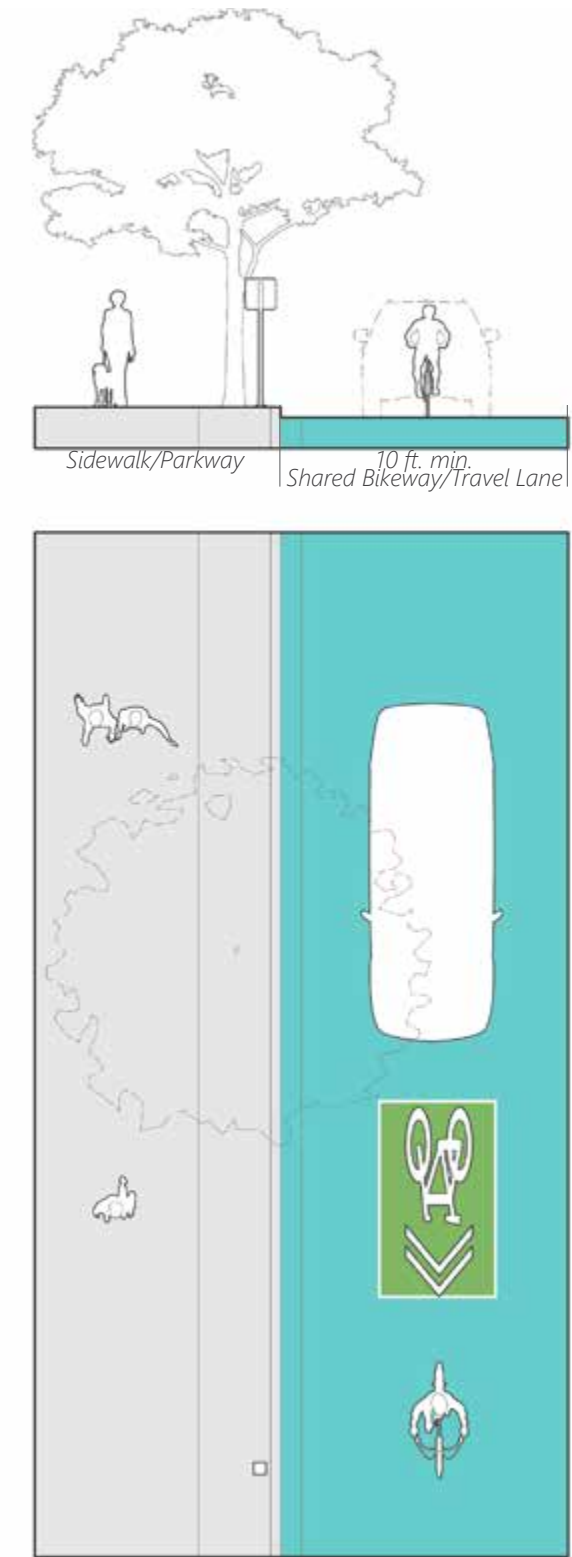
Typical Class III Bikeway with Intermittent Green Colored Shared-Lane Pavement Marking.
